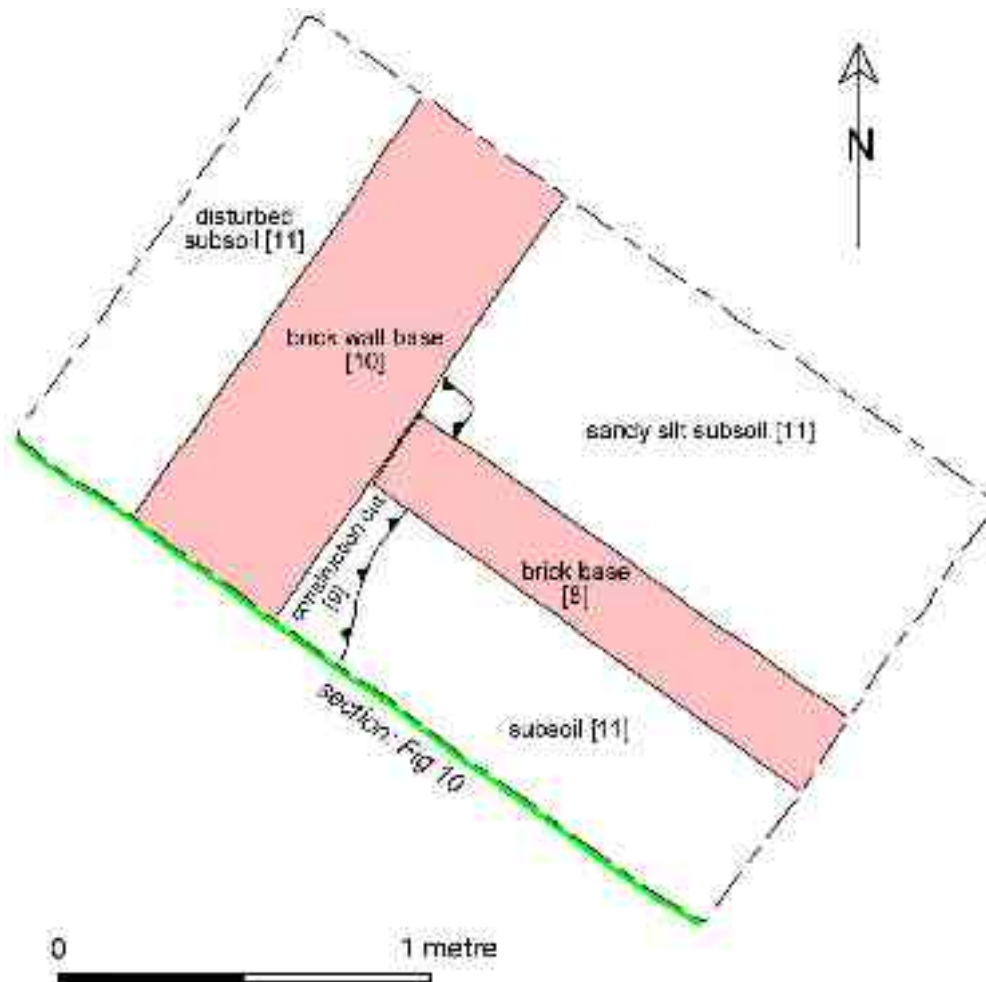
Plan of Test Pit 1 showing the principal wall base [10] and internal footing [8]
